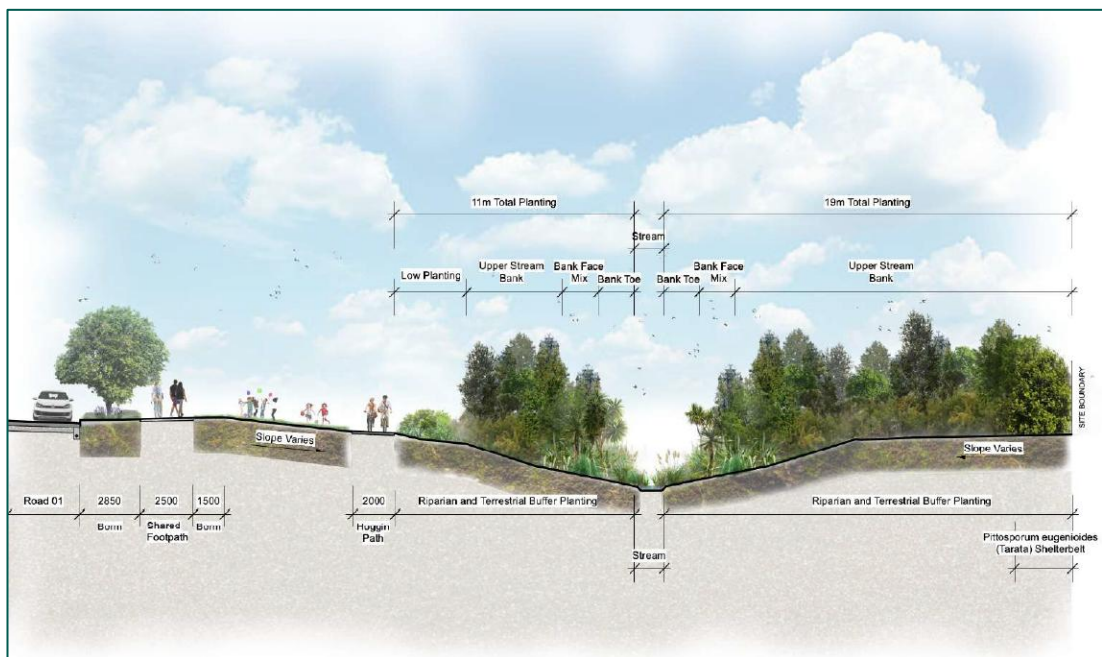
Proposed Watercourse 1 Landscape Cross Section (Source: LA4 Landscape Plans, Appendix 6)
